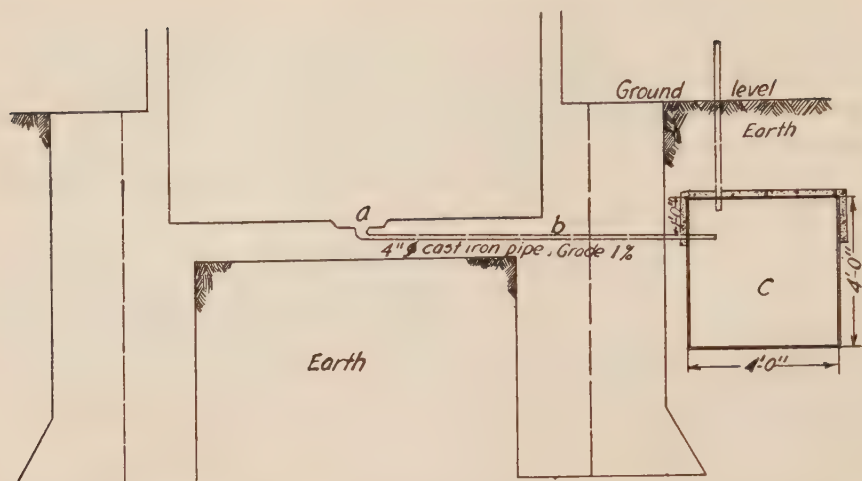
Sectional view of silo and cesspool; (a) drain hole; (b) drain pipe; (c) cesspool.
